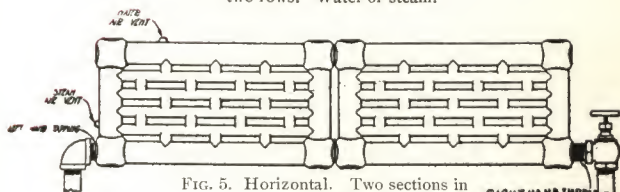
Horizontal. Two sections in two rows. Water or steam.
